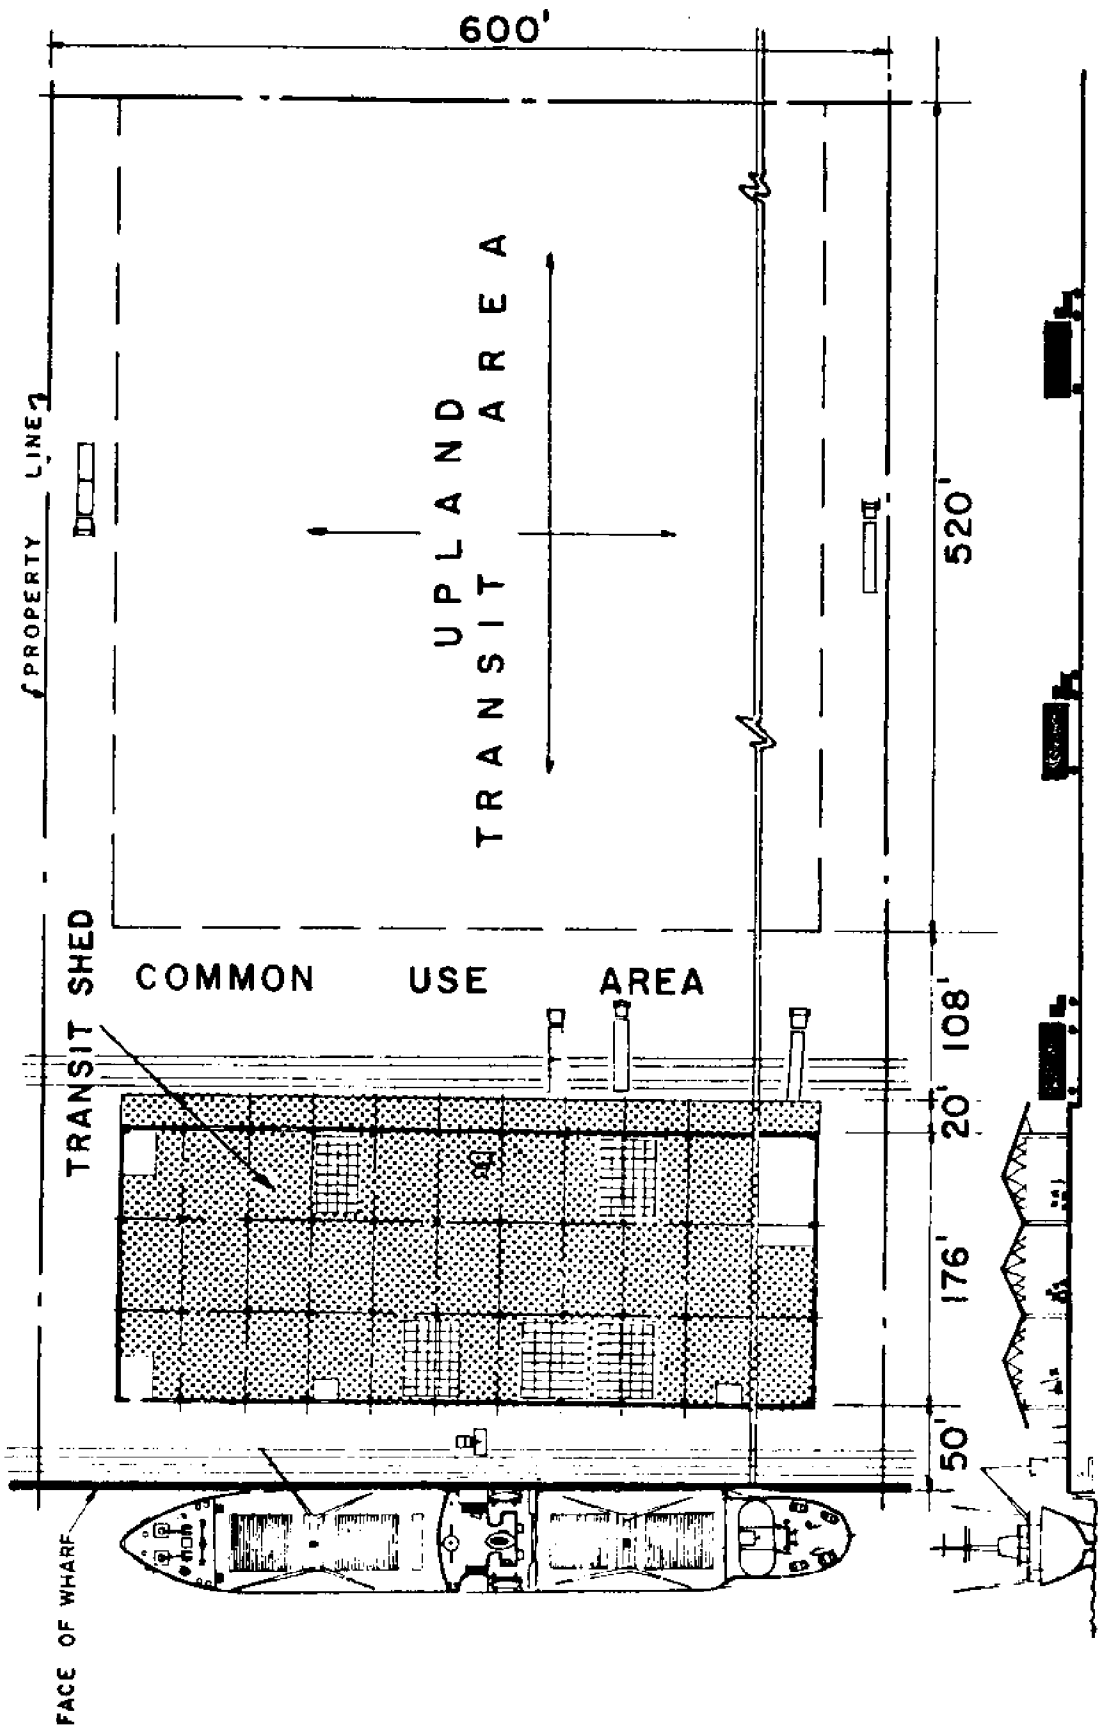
Figure A. General Plan and Section of a typical general cargo berth at Port Newark, New Jersey.
